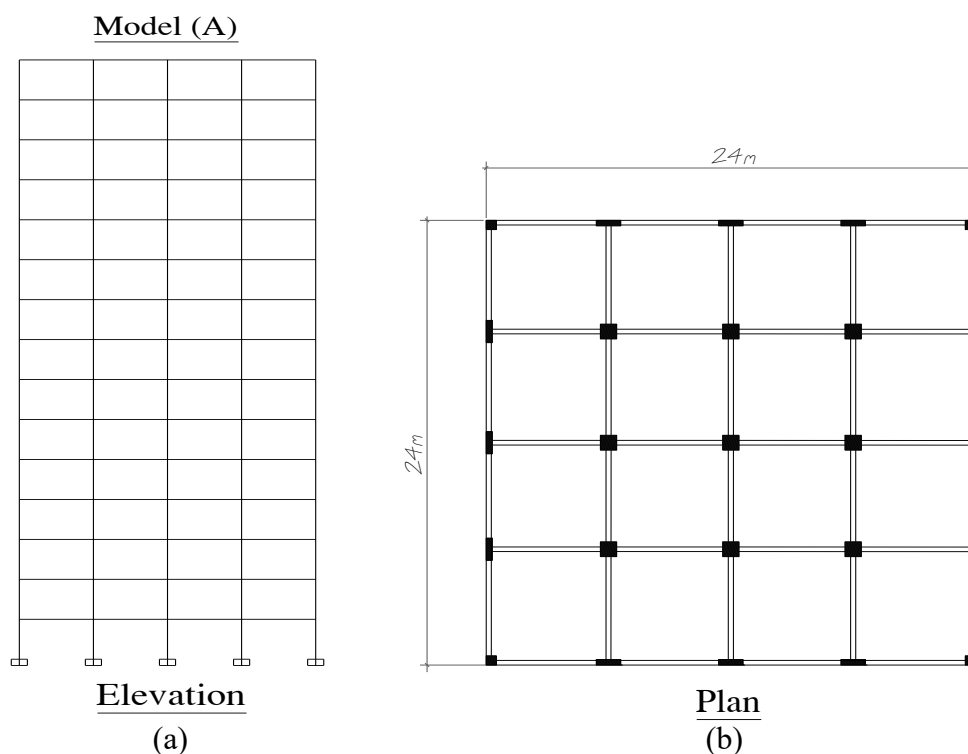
(a) The elevation and (b) plan for the studied symmetrical multi-story building.
